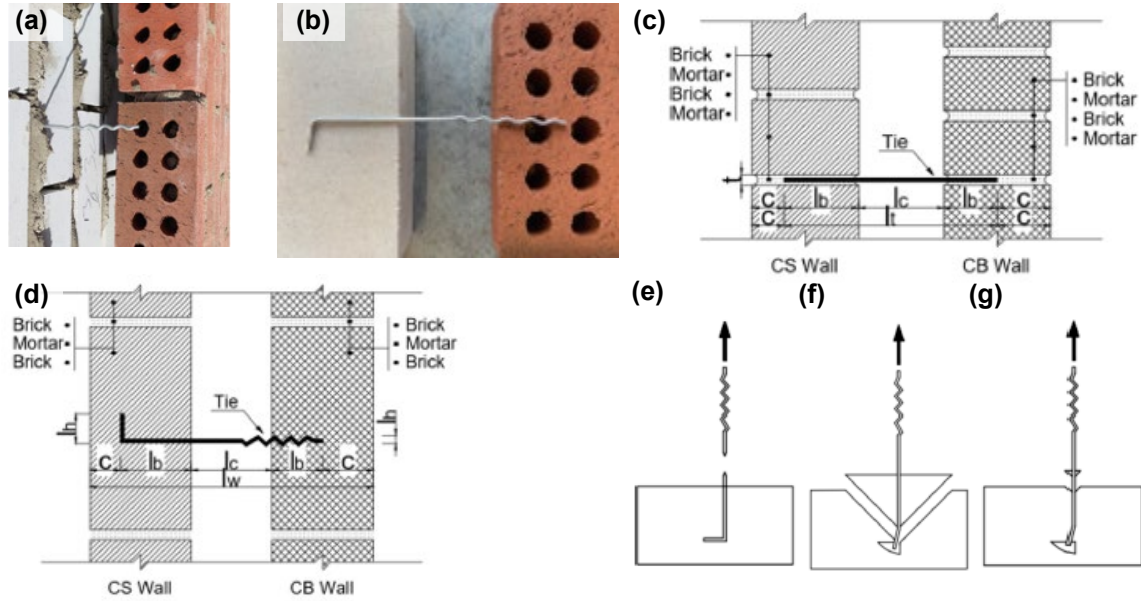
(a) Tie embedded in calcium silicate brick, (b) cavity wall tie, (c) cavity wall side view, (d) cavity wall plan view, (e) tie failure mode, (f) cone break out failure mode, (g) pull-out failure mode from Arslan et al. (2021)
